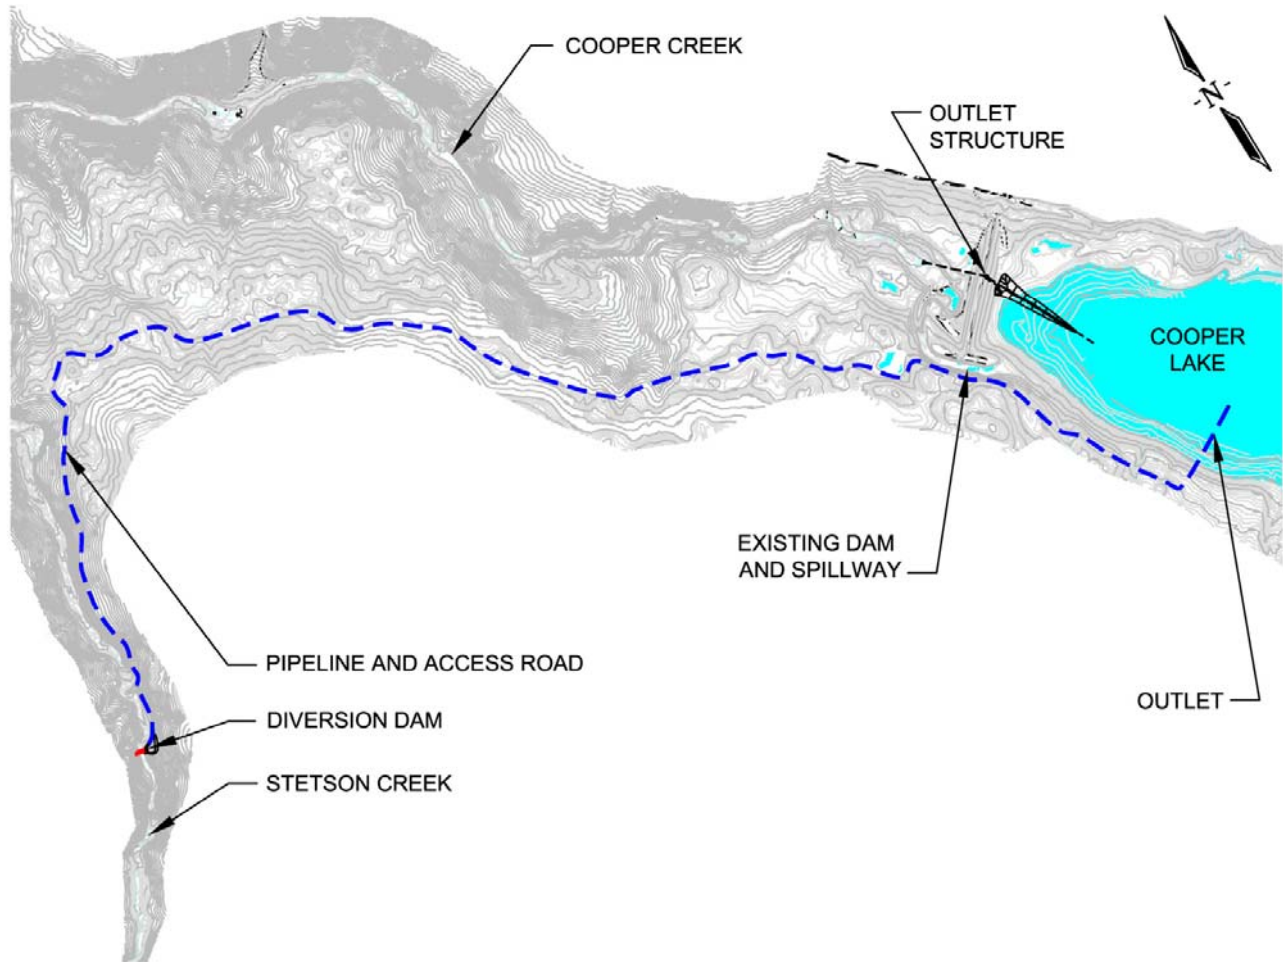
Plan of Stetson Creek Diversion, Pipeline and Gravity Outlet Structure
